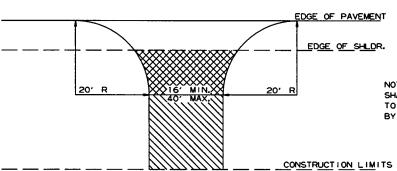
DETAIL FOR COUNTY ROAD TURNOUTS OPEN SHOULDER SECTION
